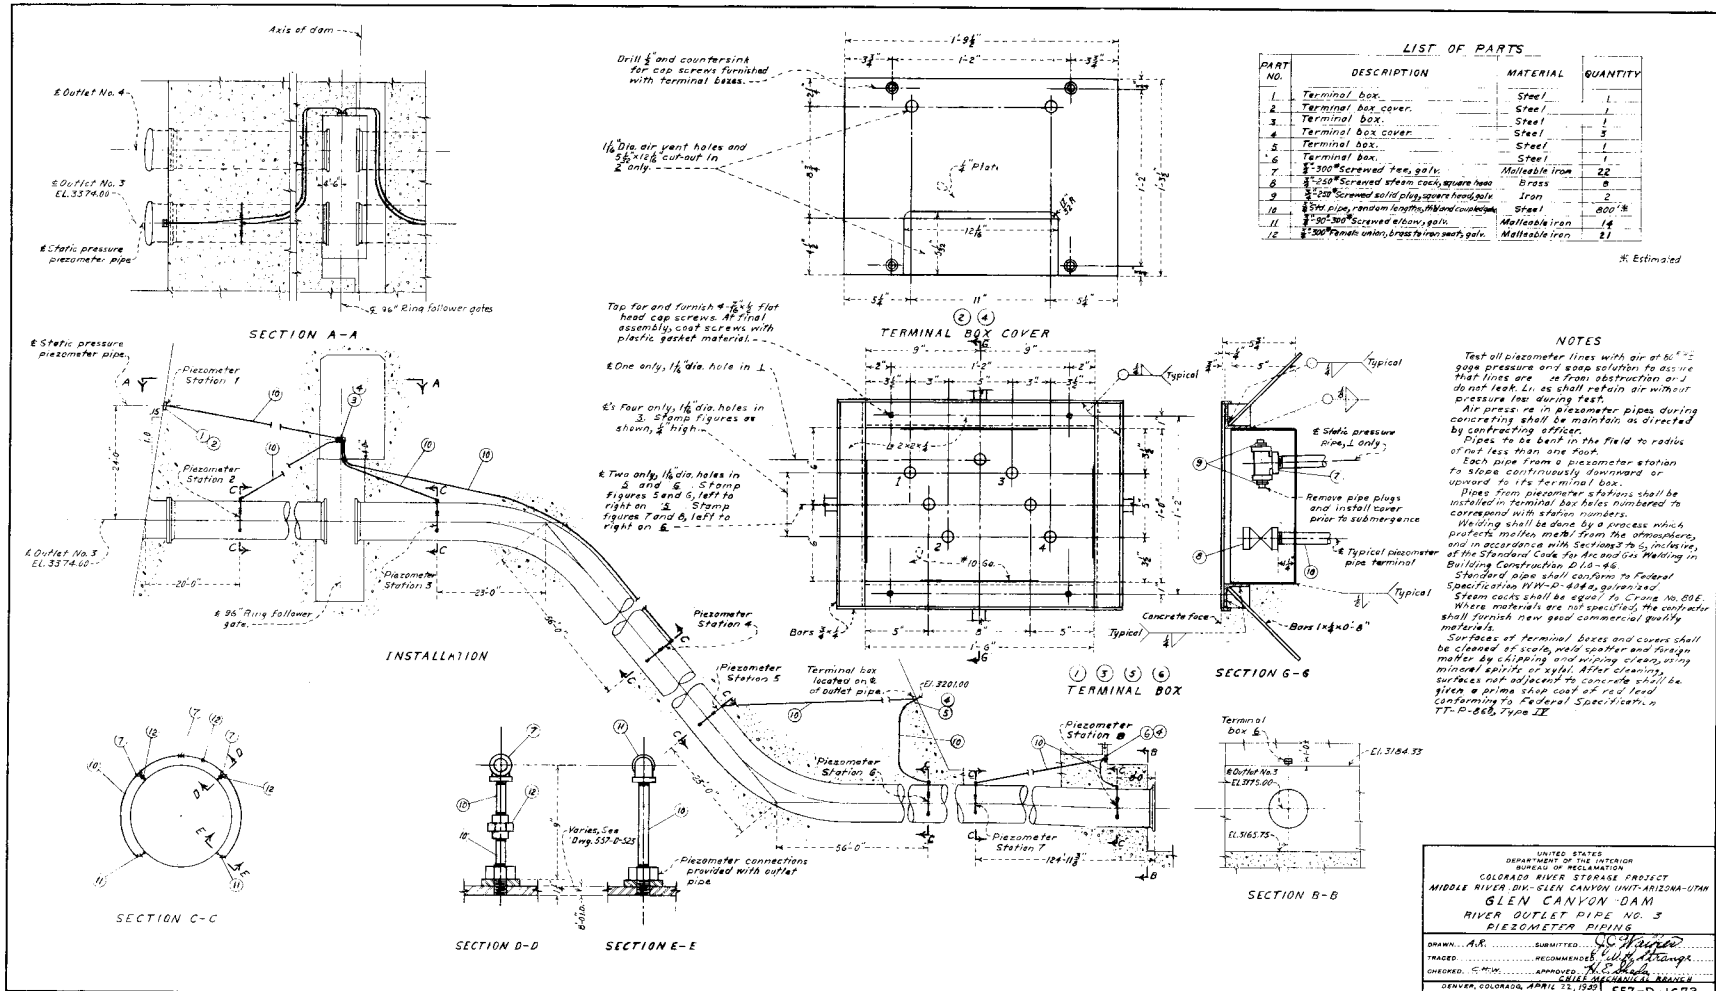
River outlet pipe No. 3—Piezometer piping.
